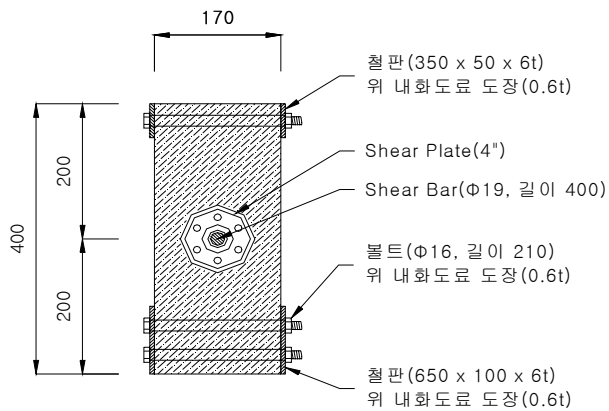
Configuration of glulam beam with separated steel plate and bolt joint at center.
